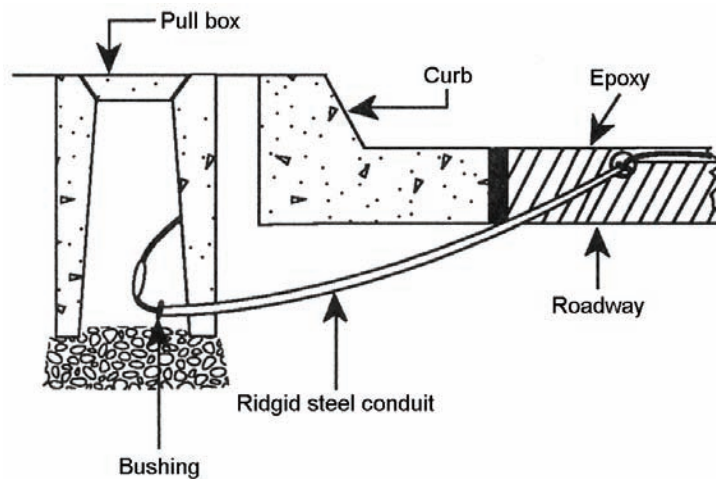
Detail of lead-in wire placement for shallow curb section.
